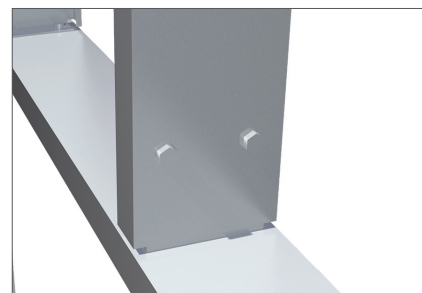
Detail of a window framing made of a C section of the same height as the side rail section. The framing section is connected to the side rail through an angle piece (TC). Holes in the framing section can be made as standard or counterformed. If counterformed holes are used, a PP packing plate is required. If straight holes are used the size of the window opening needs to be enlarged by the size of the bolt heads.
